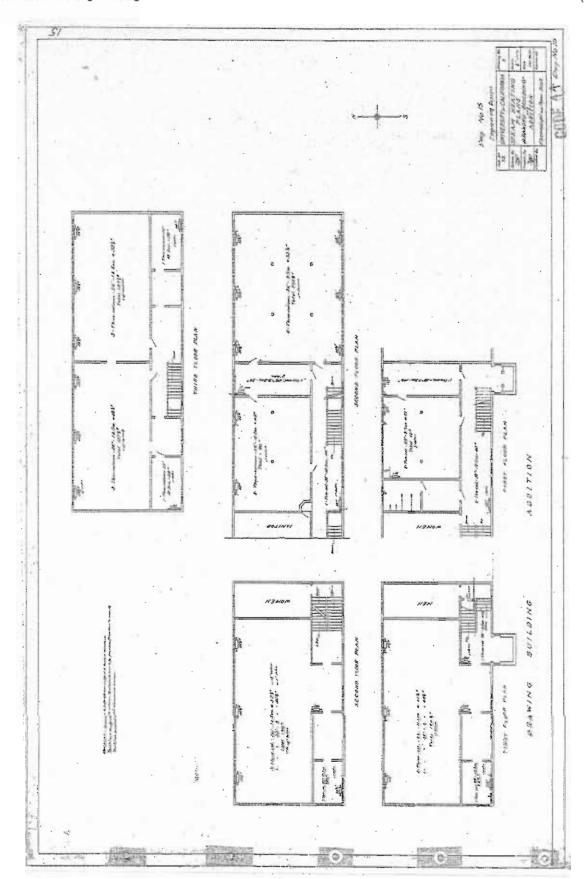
Drawing Building, Steam Heating Plan - Floor Plans (Capital Projects, Plan Room, UC Berkeley)
